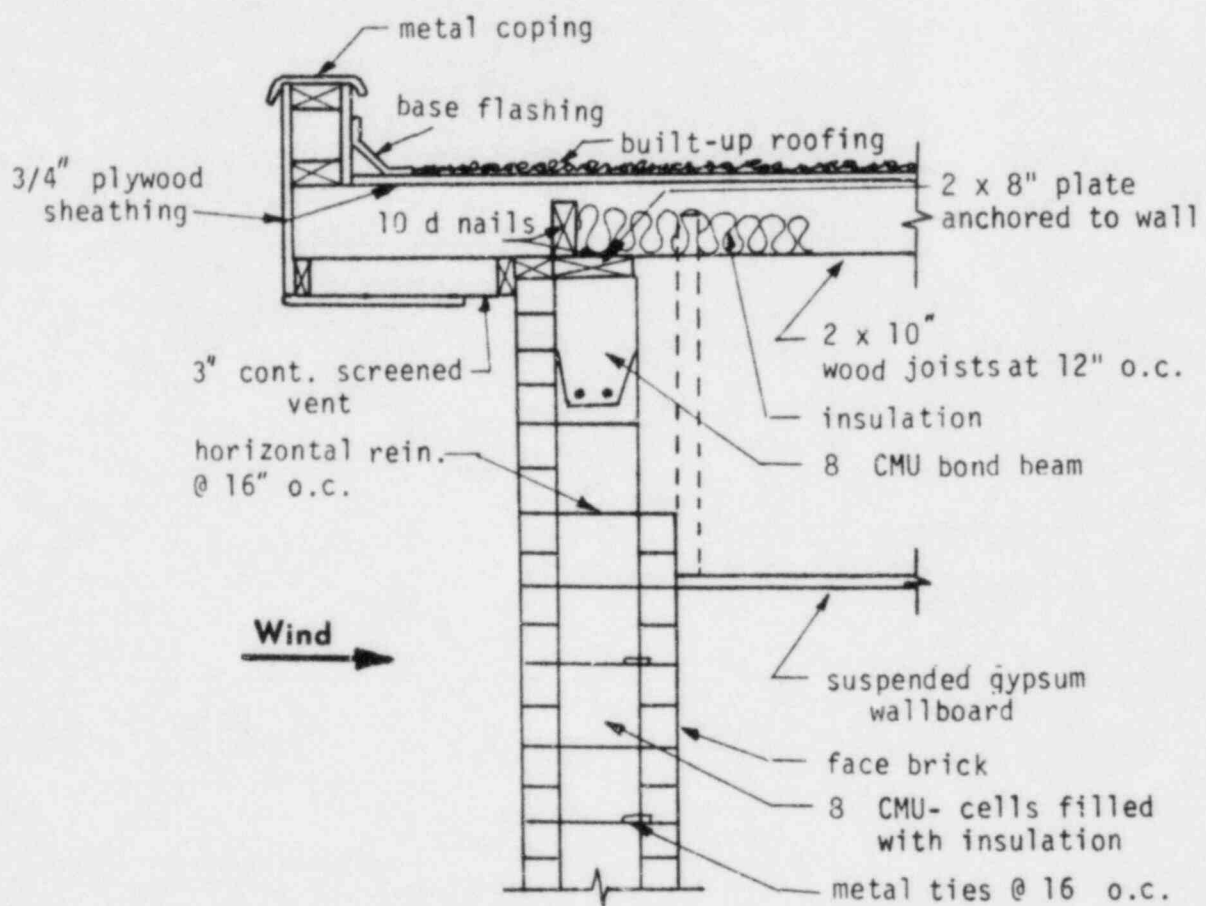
Windward roof-wall detail of the Dining Hall at Section A.
